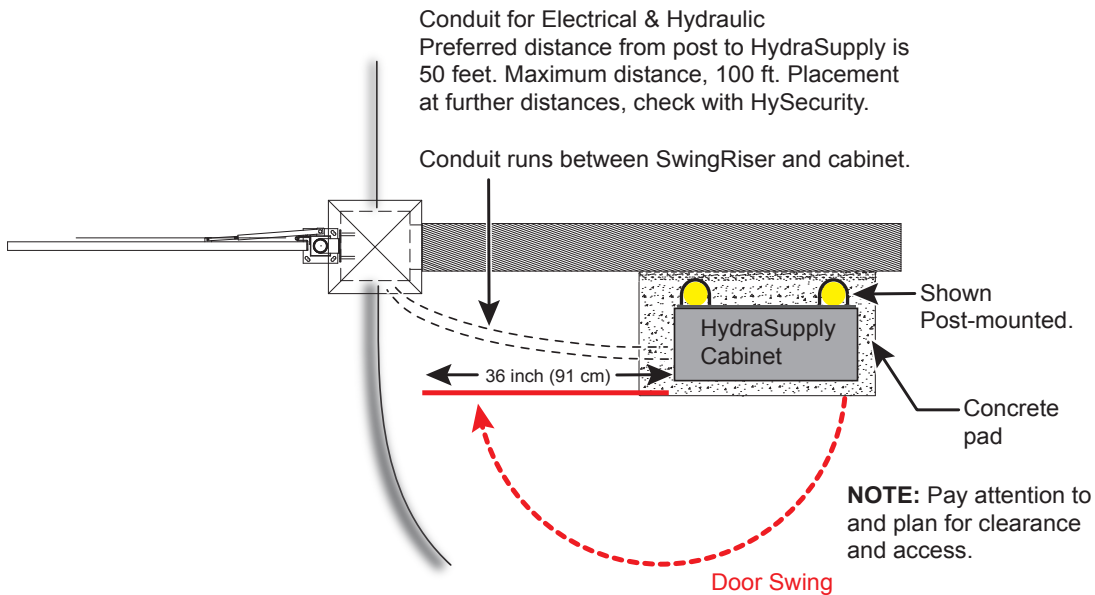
HydraSupply Installation Overview Top Electrical and Hydraulic Conduits
